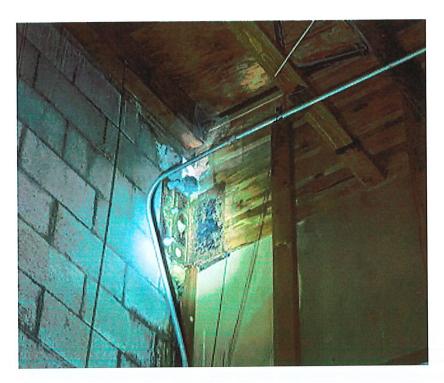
Visible daylight behind deteriorated glulam beam, Building C
